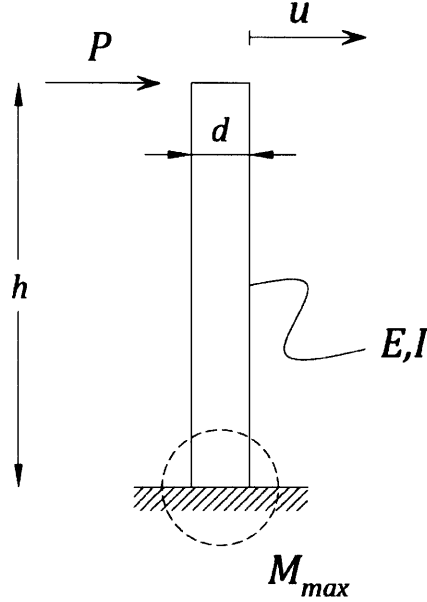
Simple Cantilever Beam Model of a Tall Building
